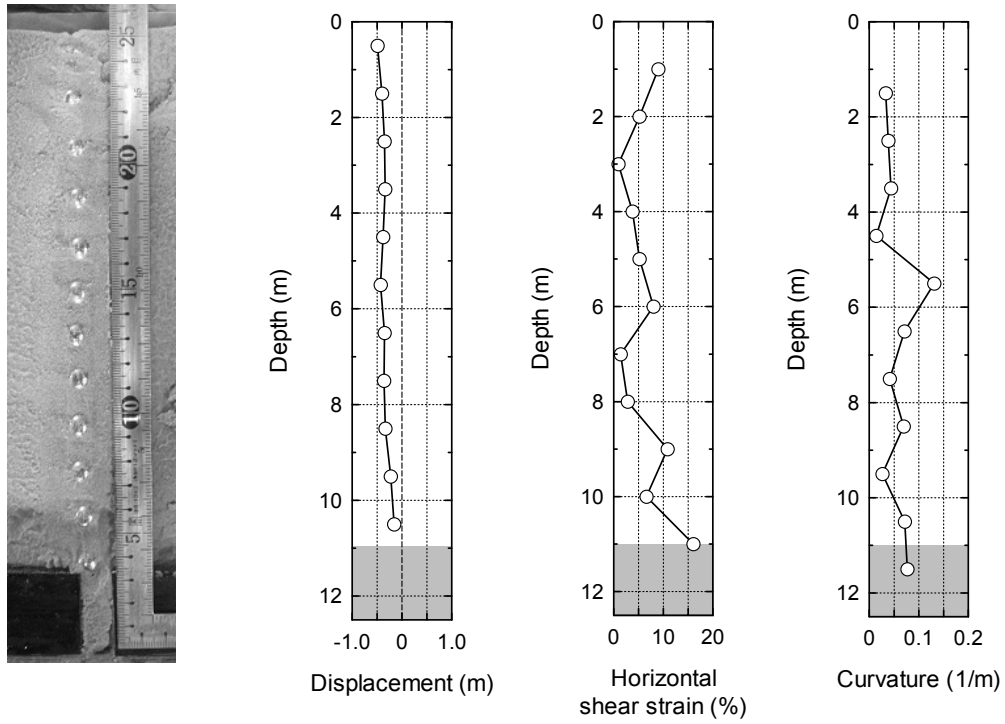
Horizontal deformation of SBM cutoff wall in Case-6.
